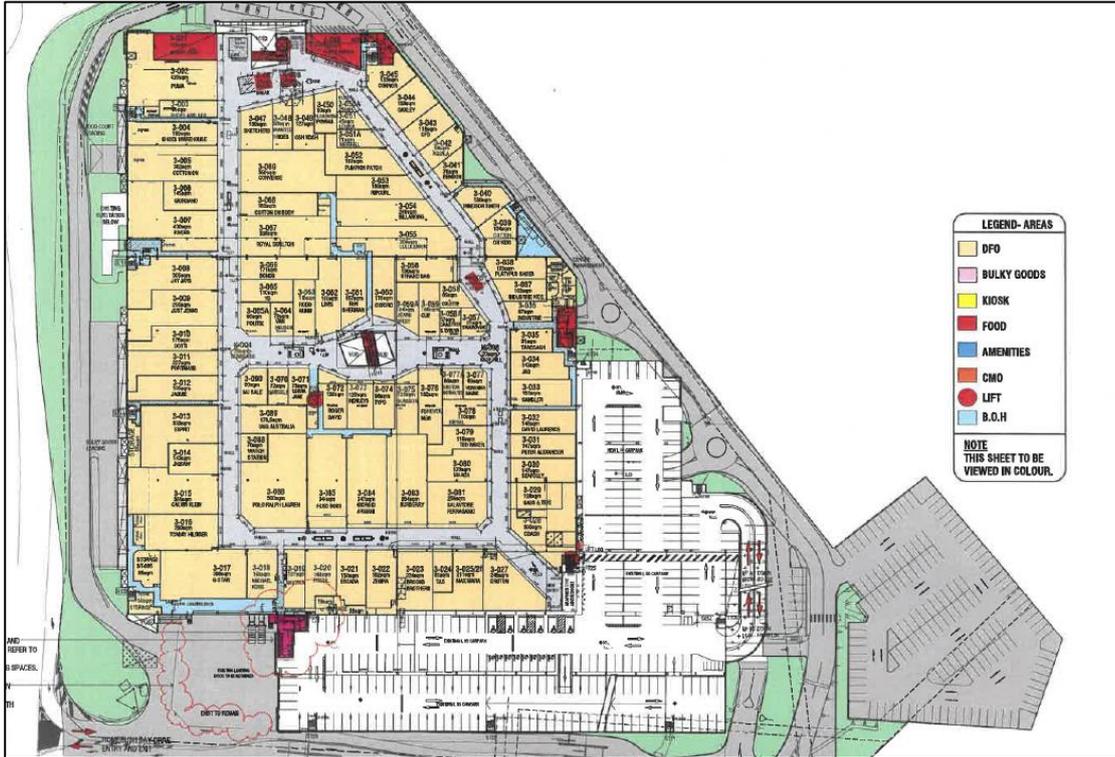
Approved Tenancy Layout Plan as per DA2008/087/6.
